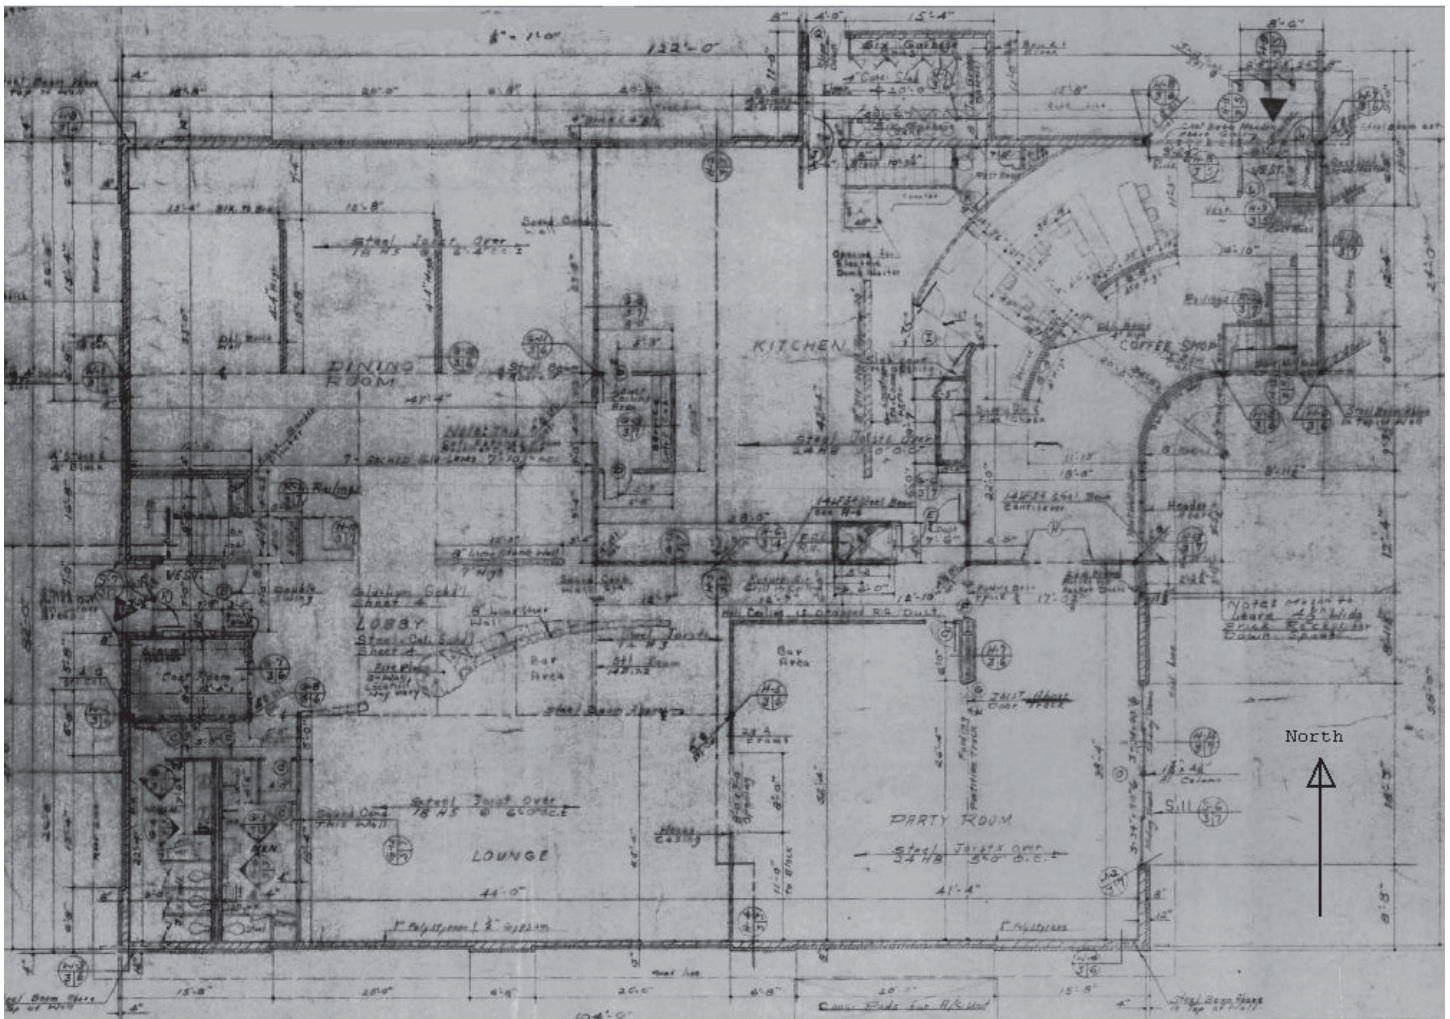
Original supper club first floor plan, 1966 (Building plans)
